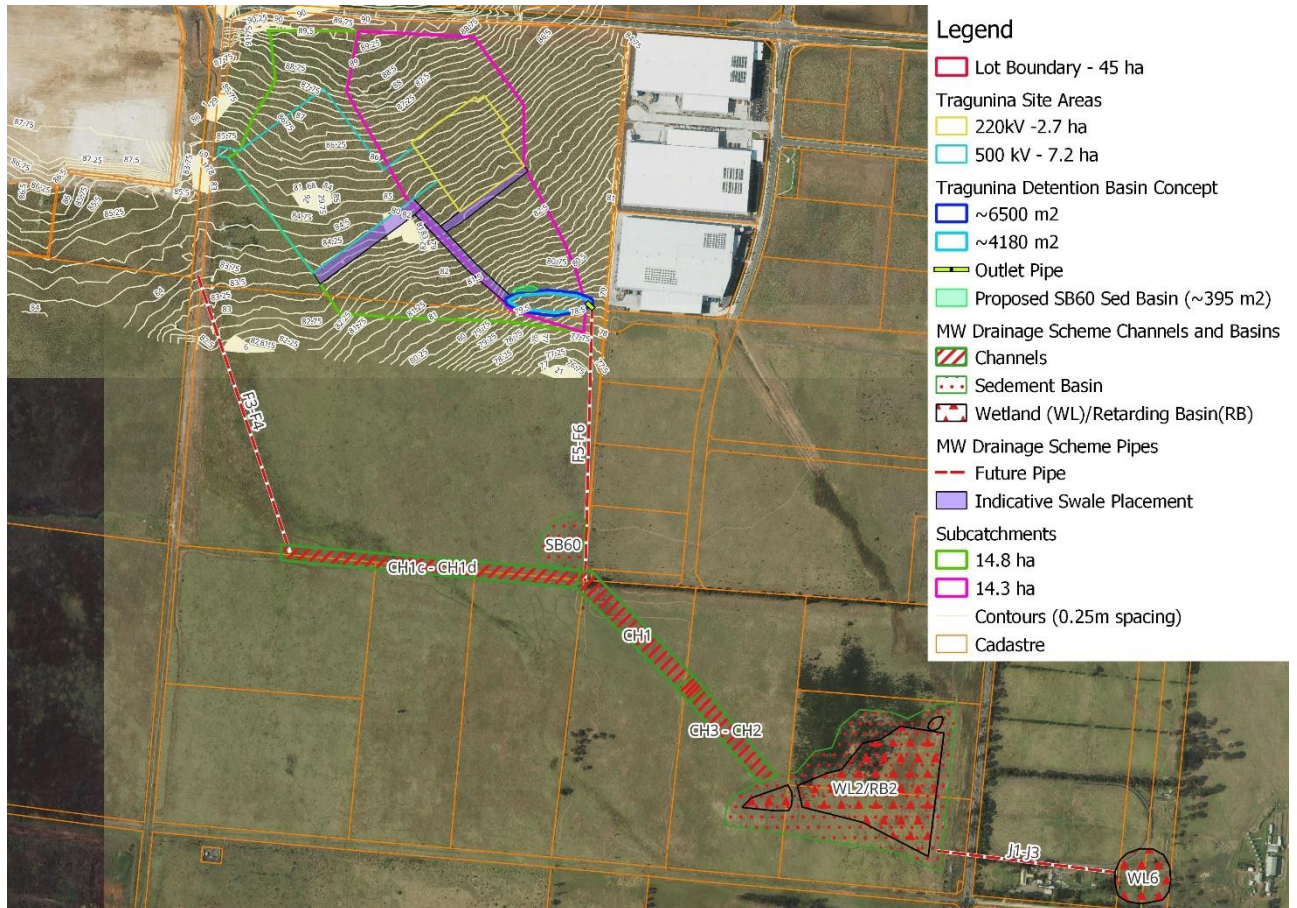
Indicative Layout of Site with Temporary Retarding Basin, Swale/Drainage and downstream Melbourne Water Drainage Scheme works
